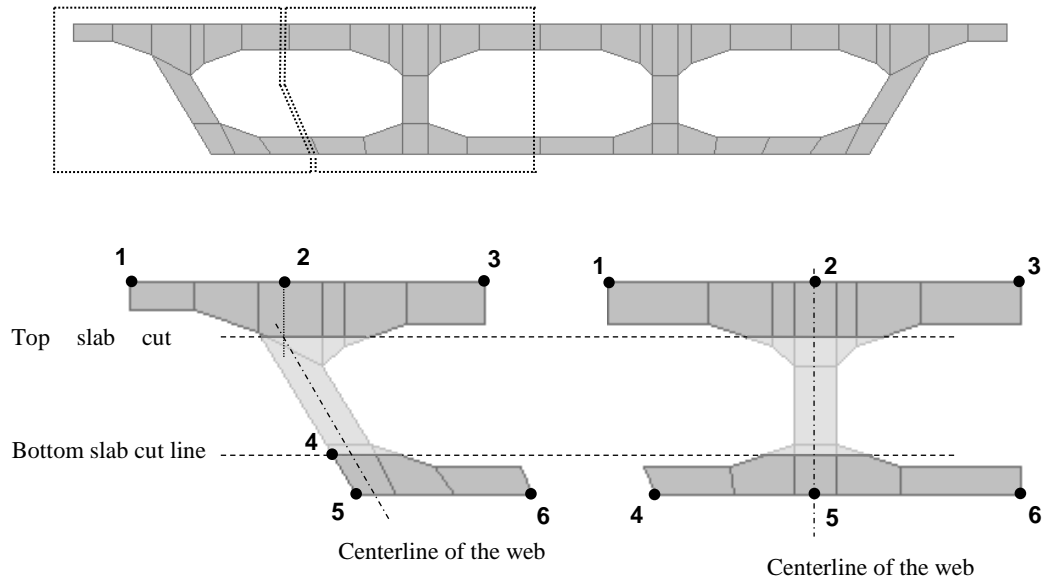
Bridge Concrete Box Deck Section - External Girders Sloped
